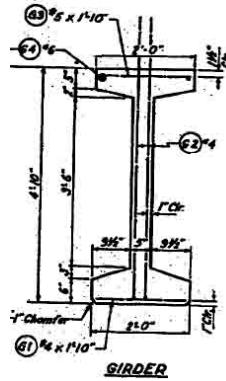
Bridge 5/649 Girder Detail
